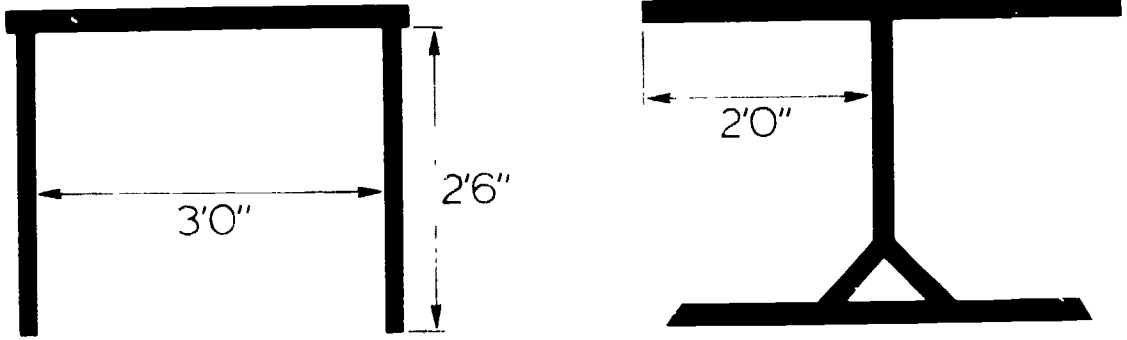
An accessible workstation for a student confined to a wheelchair will be 3' 0" wide, 2' 0" deep, and 2' 6" high.
